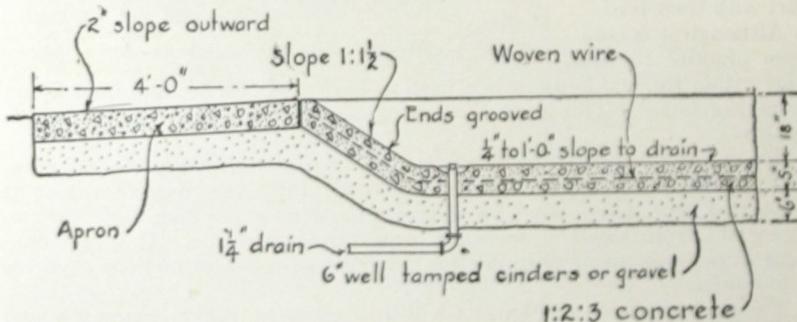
Partial Sectional View of a Concrete Hog Wallow. The wallow is simply a big concrete bowl with a floor 4 feet wide around the edge.
